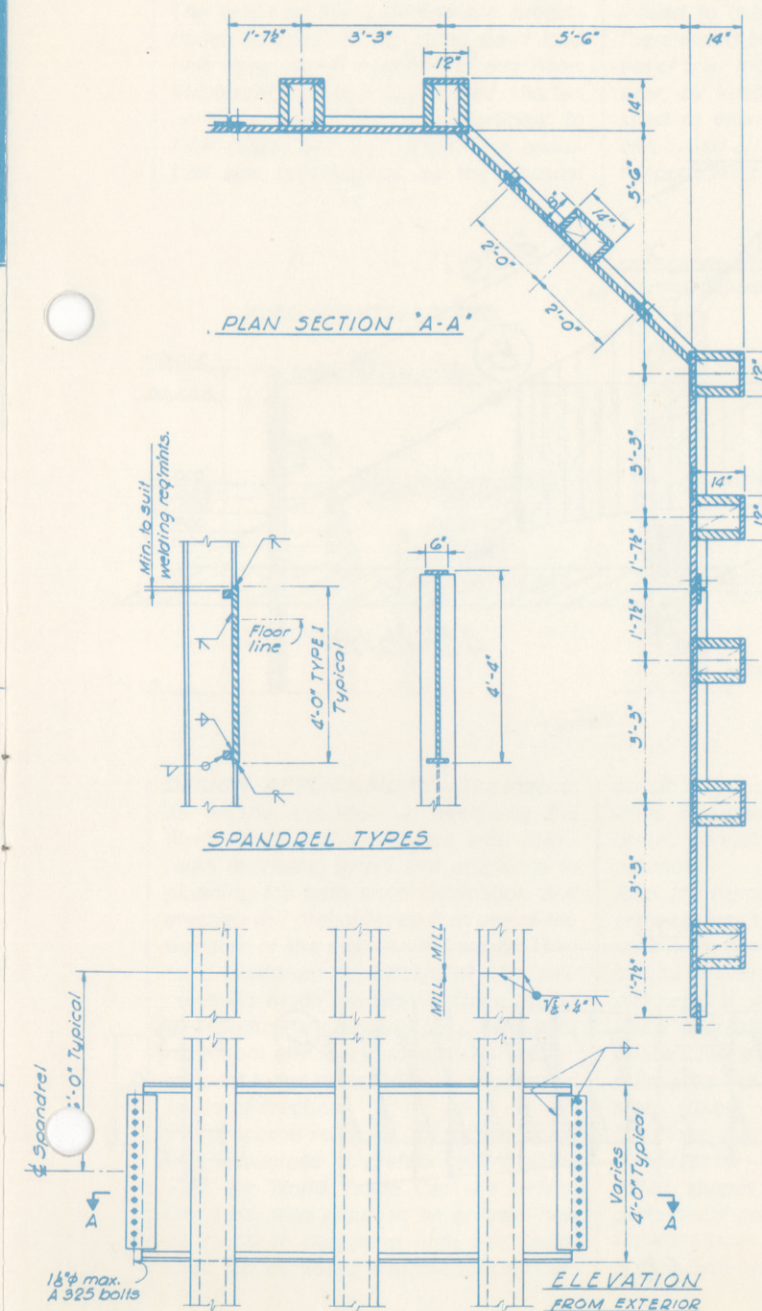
shows a plan and detail of the exterior framing system. The exterior columns illustrated are spaced 3 foot-3 inches on center around the entire periphery of each tower. These columns will run uninterrupted from about 80 feet above street level to the roof. Below this 80 foot level loads are to be transferred to larger columns spaced 9 feet-9 inches on center. This provides wider spacing at the lobby level for entrance doors. These columns are to be prefabricated from steel plate using various grades of high strength steel ranging from low alloy heat treated steel with yield points up to 100,000 psi to ASTM Designation A-441 steel with a minimum yield point of 42,000 psi. At each floor level a spandrel is provided, also fabricated of plate as shown in the elevation section in Figure 5. The spandrel and column sections are to
